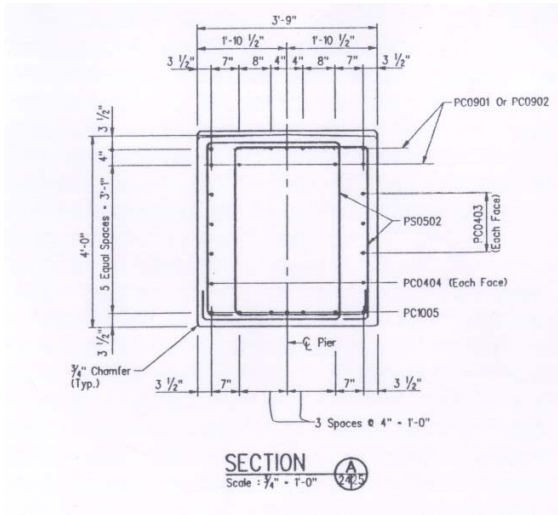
The actual pier cap beam cross section [Brown, 1993]. The  $\frac{3}{4}'' = 1'-0''$  scale is no longer correct.
